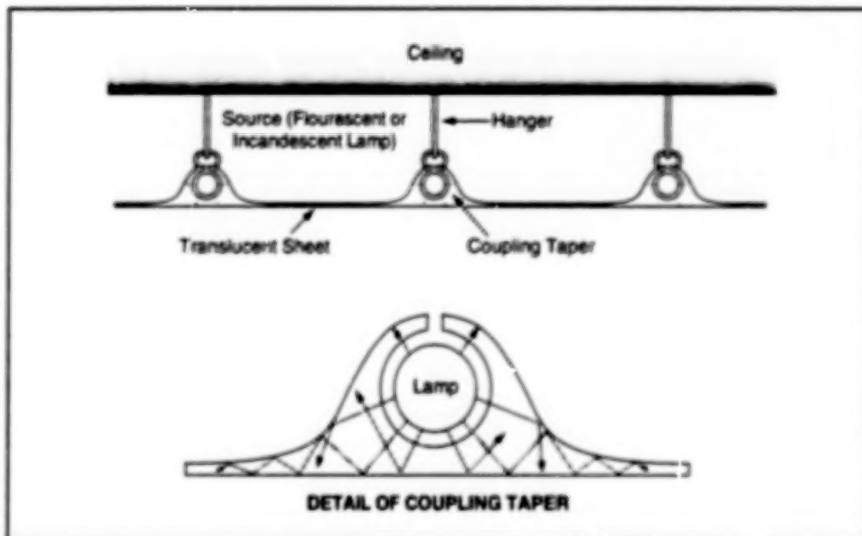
Light Propagating in the Sheet by internal reflection would be scattered out, providing diffuse illumination.
